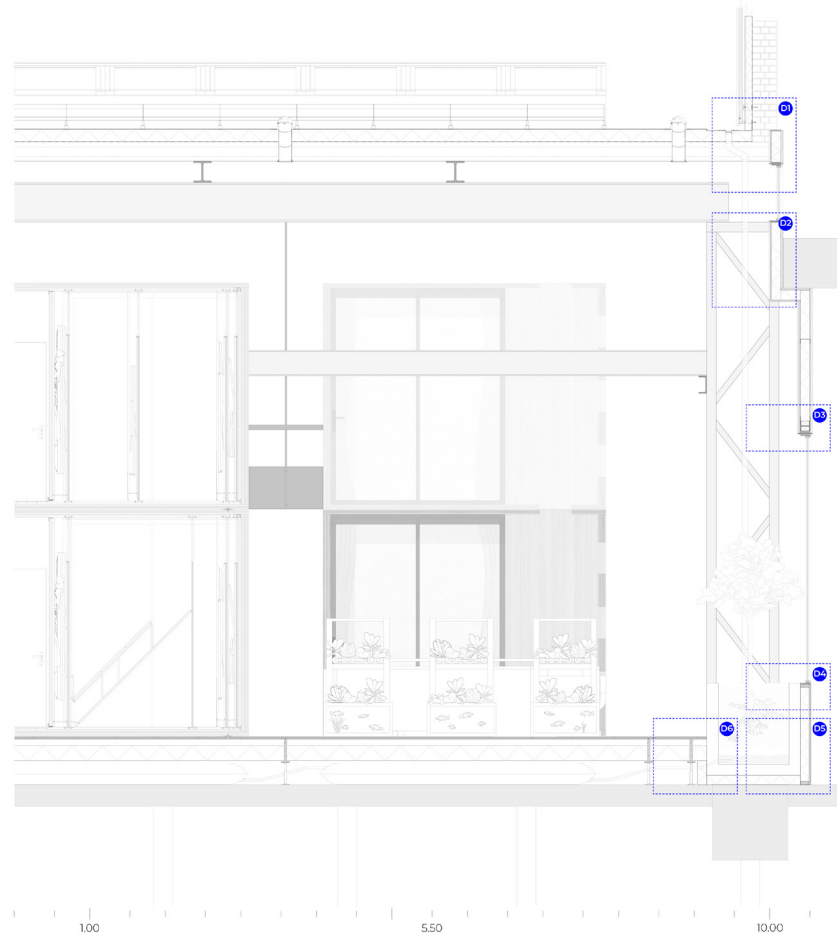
# DETAIL DRAWINGS | VERTICAL SECTION C | SCALE 1:10
